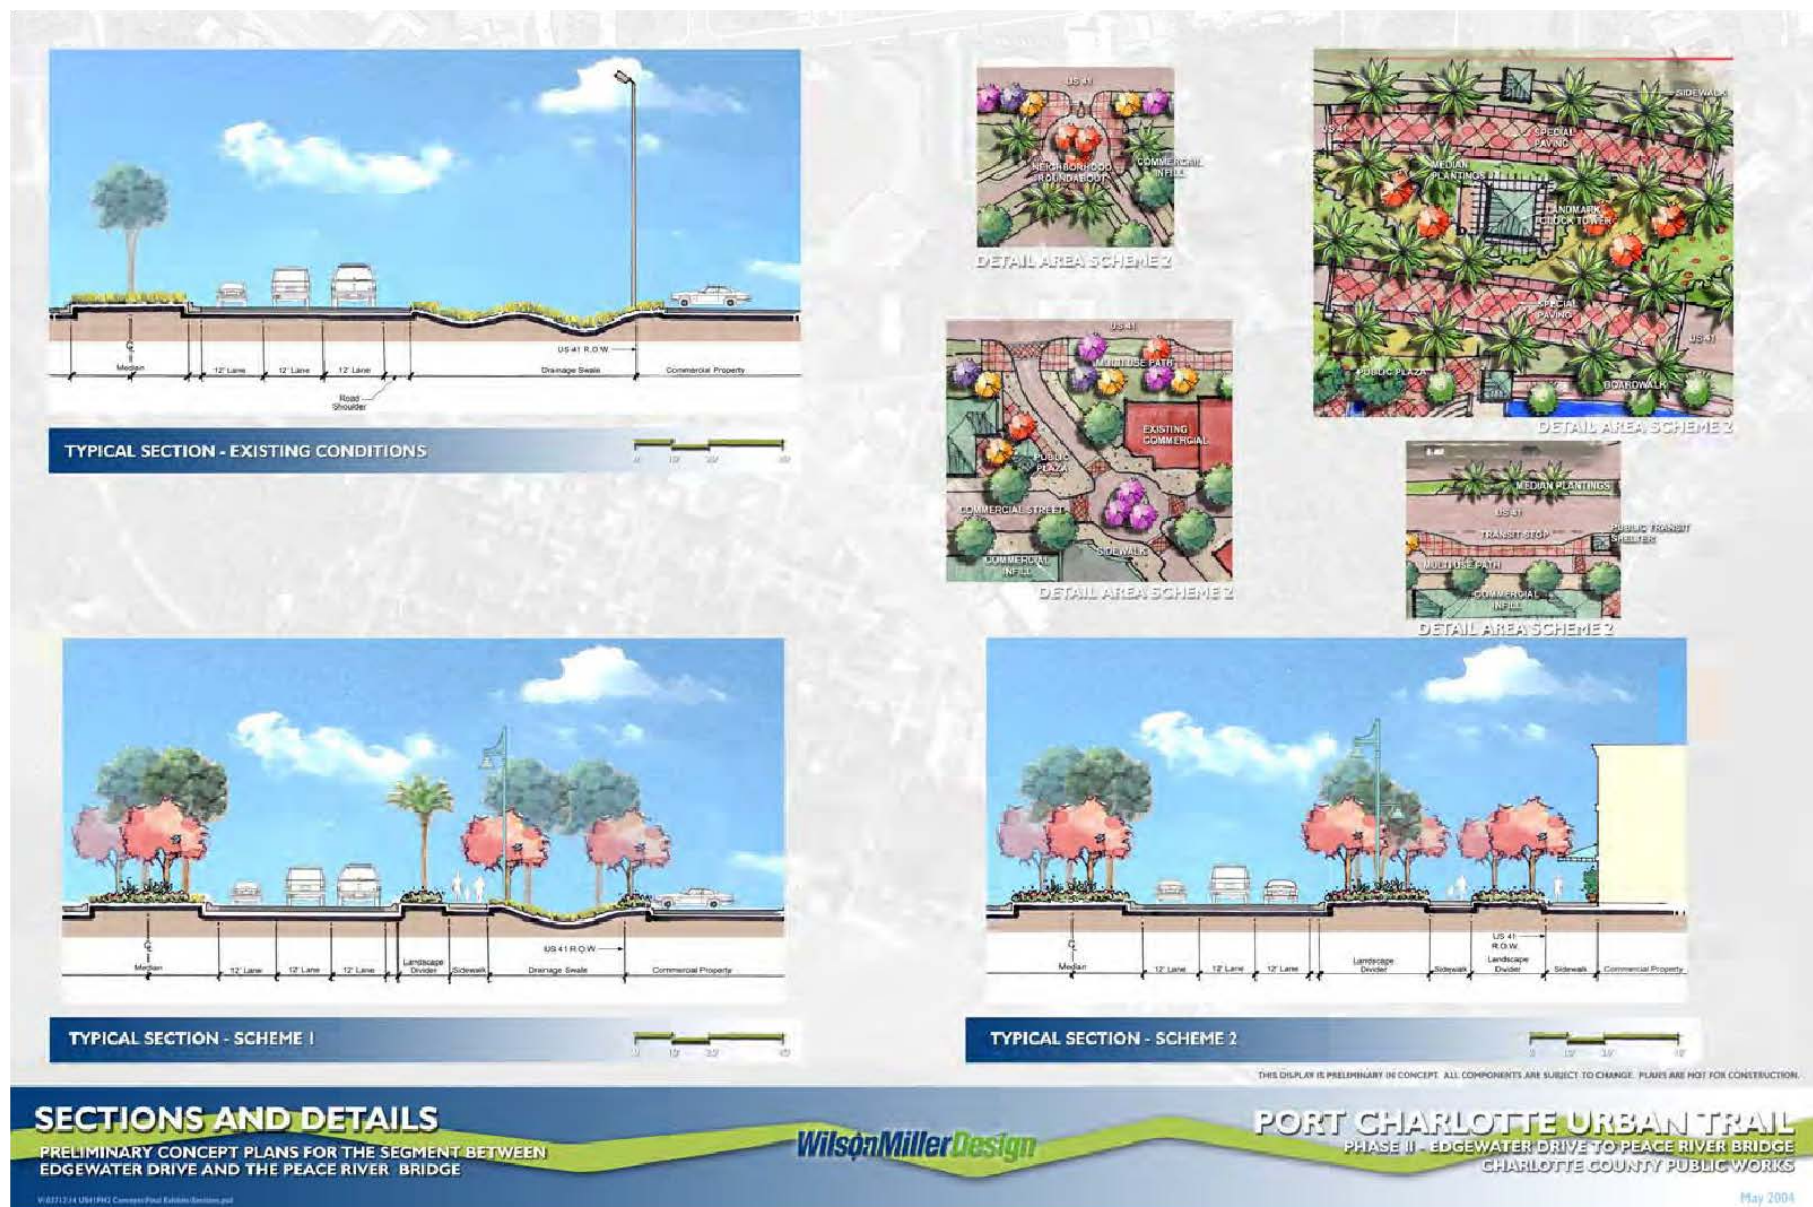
Some elevation sketches of the conceptual plan for the US 41 corridor revitalization designed by Wilson-Miller
